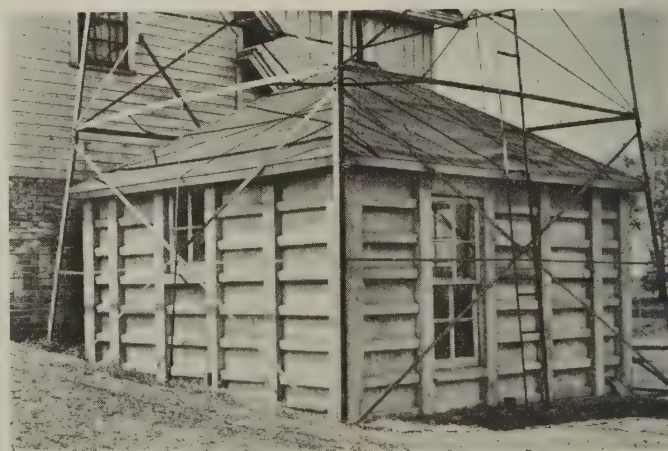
Milk cooling house of construction described in accompanying article. Notice the use of half staves on the near side of the house. Every dairy farm is a potential market for a milk house and several other small buildings
